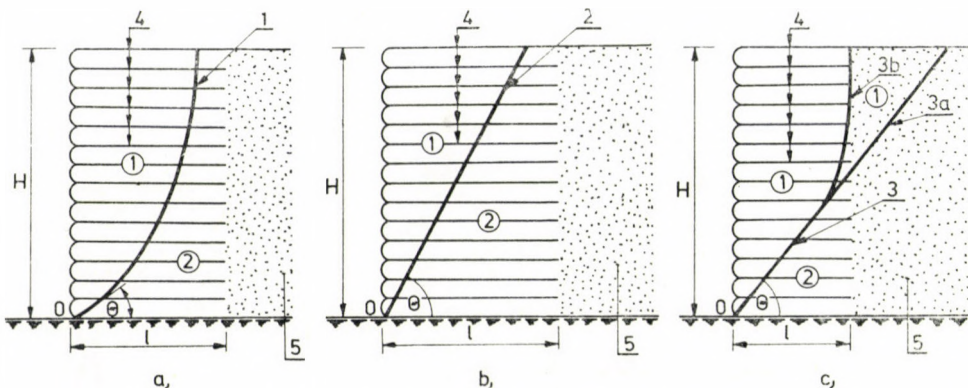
Failure surfaces inside the reinforced earth wall; a — SCHLOSSER, b — LEE et al. c — BACOT; 1 — parabola, 2 — plane, 3 — double failure surface (parabola and plane), 4 — strips, 5 — backfill
